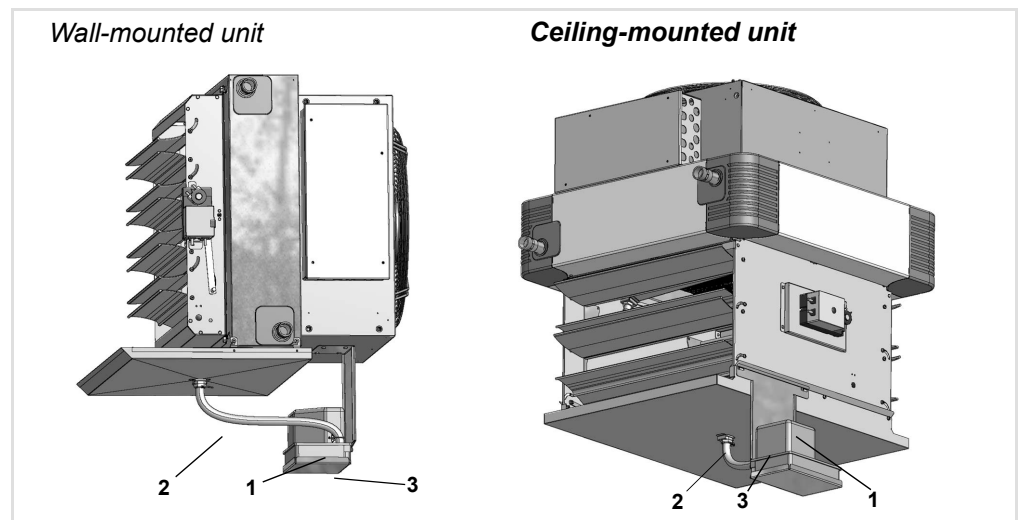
Condensate pump in wall-mounted and ceiling-mounted units
